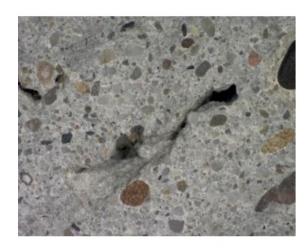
Core B-2 concrete with cracking near surface at suspected cold joint. 10x magnification.
